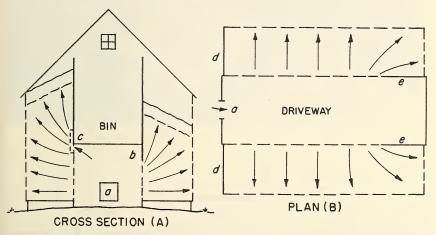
Preparation of a frame double crib for ventilation. Cross section (A) and floor plan (B) are shown.
